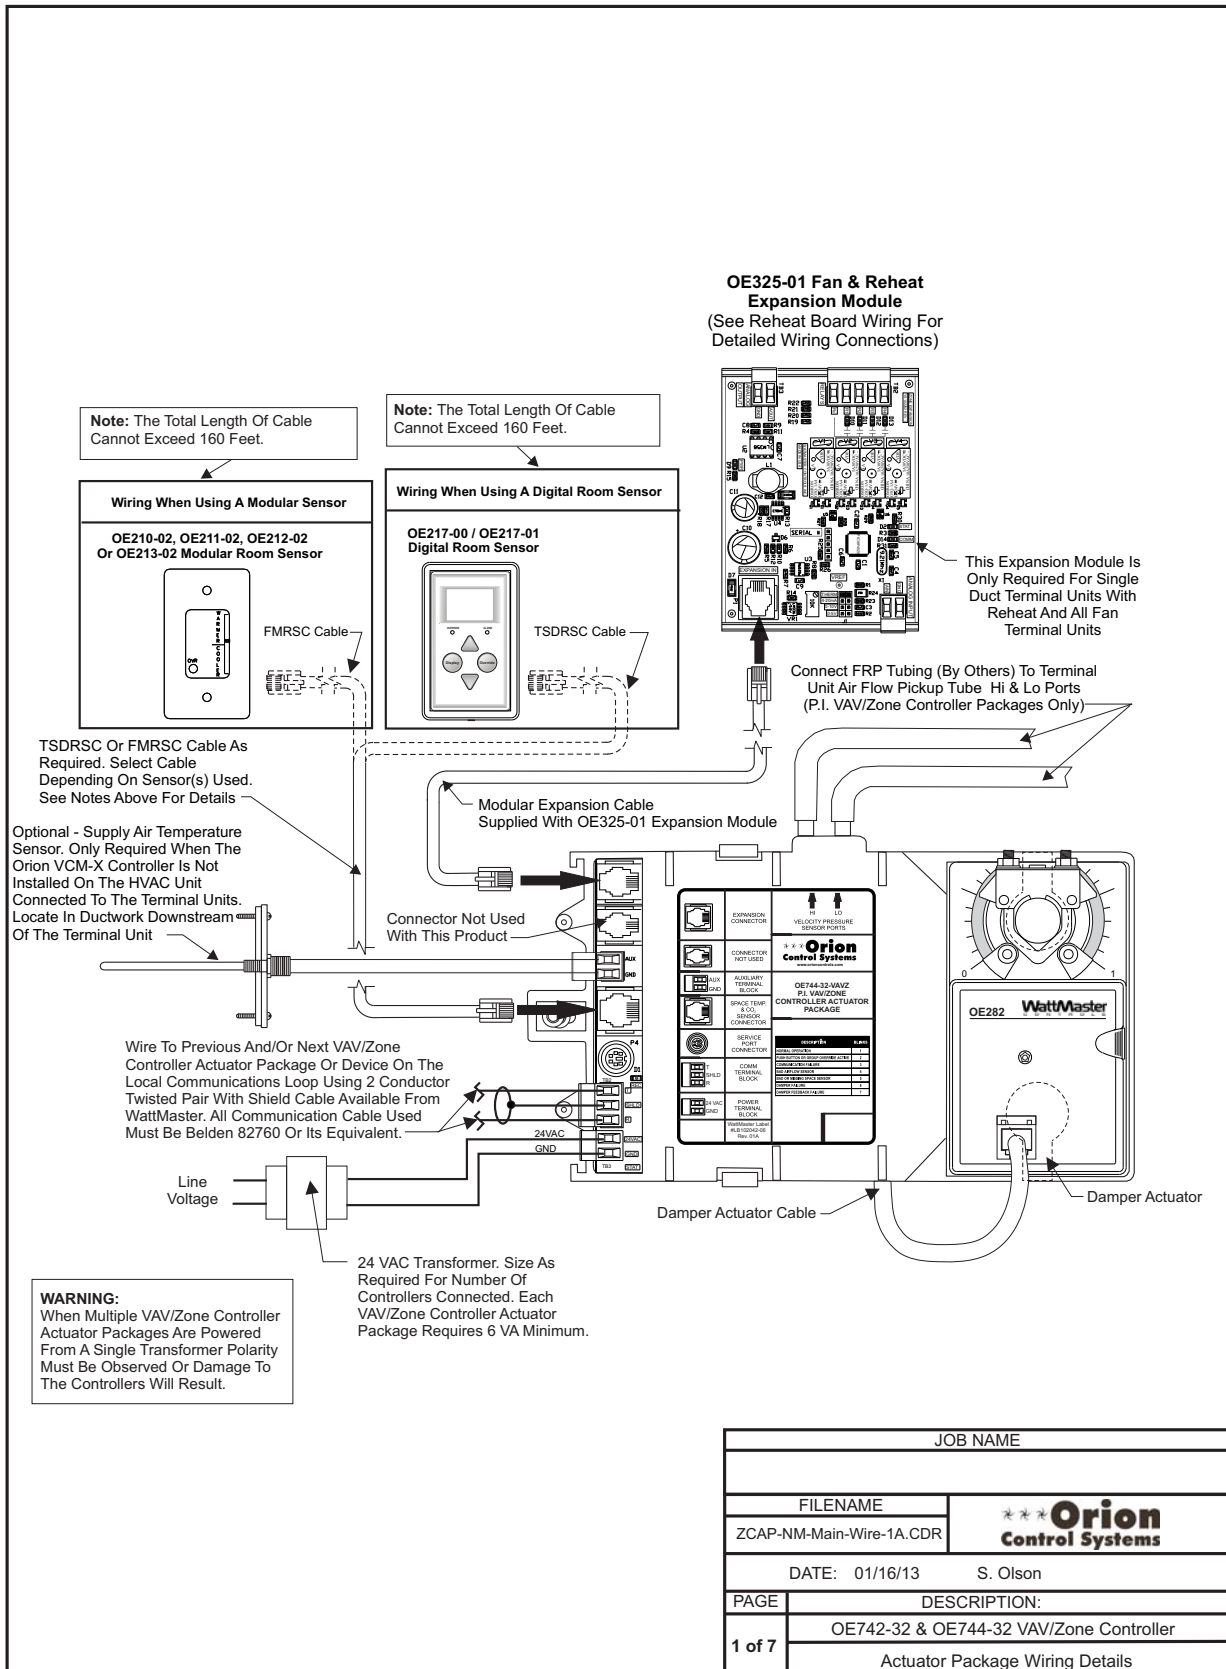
OE742-32 & OE744-32 - Non-Modular Zone Controller Actuator Package - P.I. & P.D. Wiring
